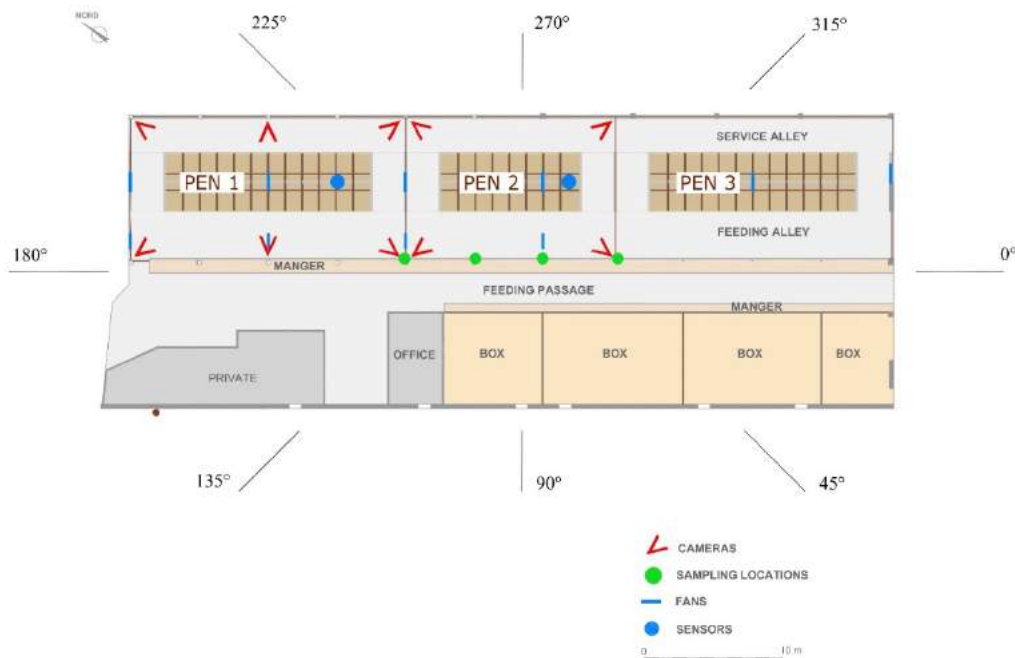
Plan view of the barn and position of sampling locations, cameras, fans, and sensors.
